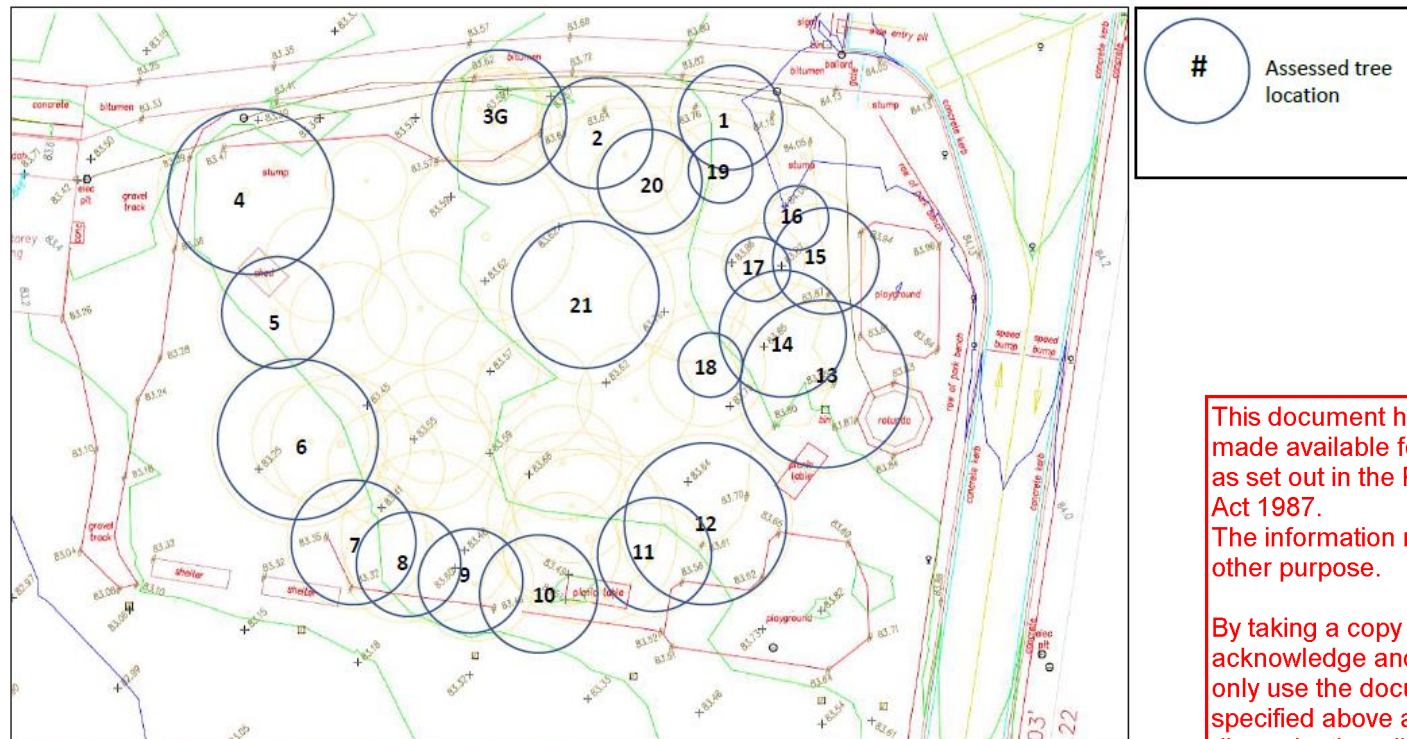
Re-establishment Plan & Features Plan (One Plan Land Development Group)
